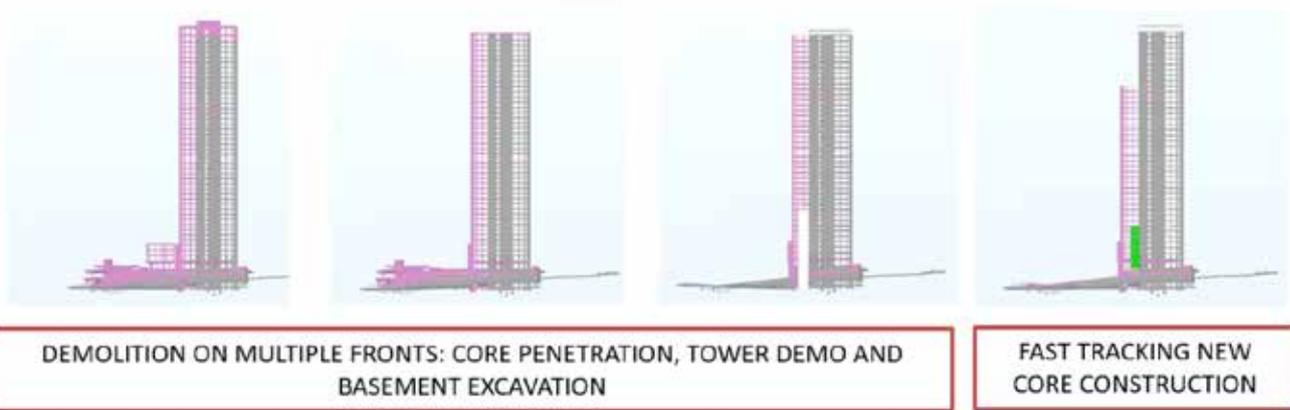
Demolition of tower underway (left), penetration through existing building (centre), fast tracked core construction through existing building whilst demolition above (right).
